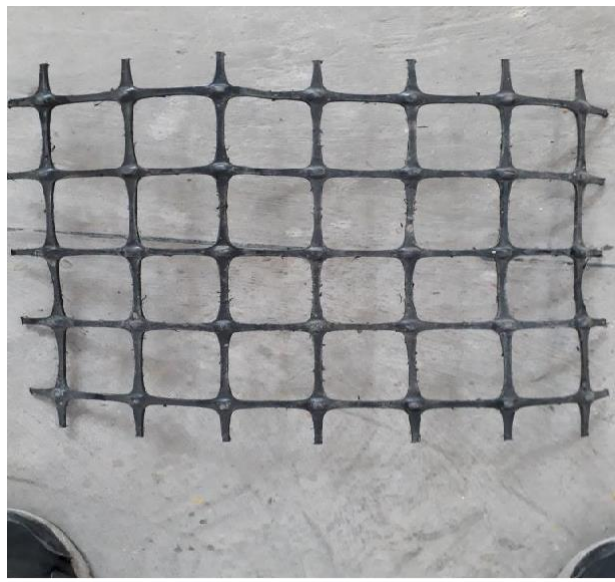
Geo-grid as Reinforcement Used in Laboratory on Pull out test
